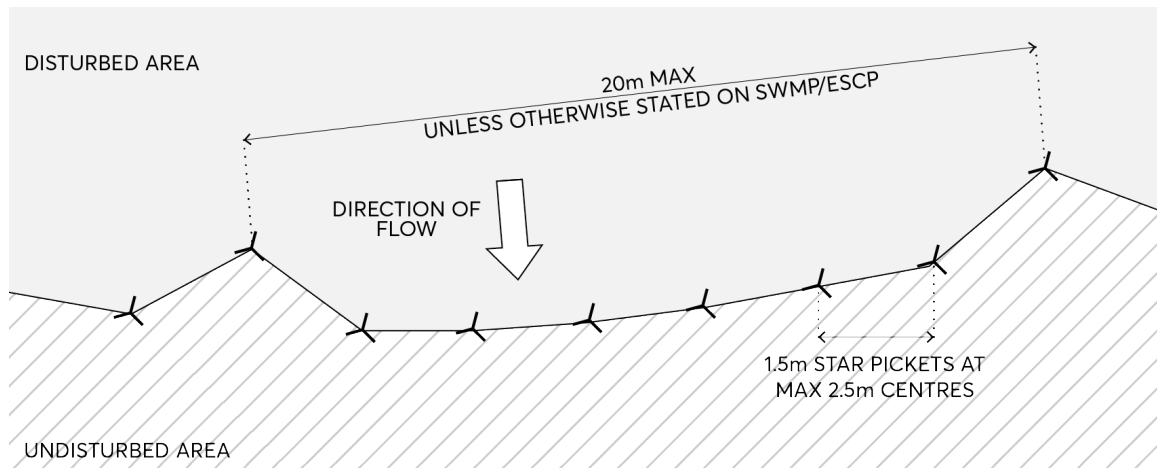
Plan – Sedimentation Fencing (Source: Soils and Construction: Managing Urban Stormwater, Landcom, March 2004)
